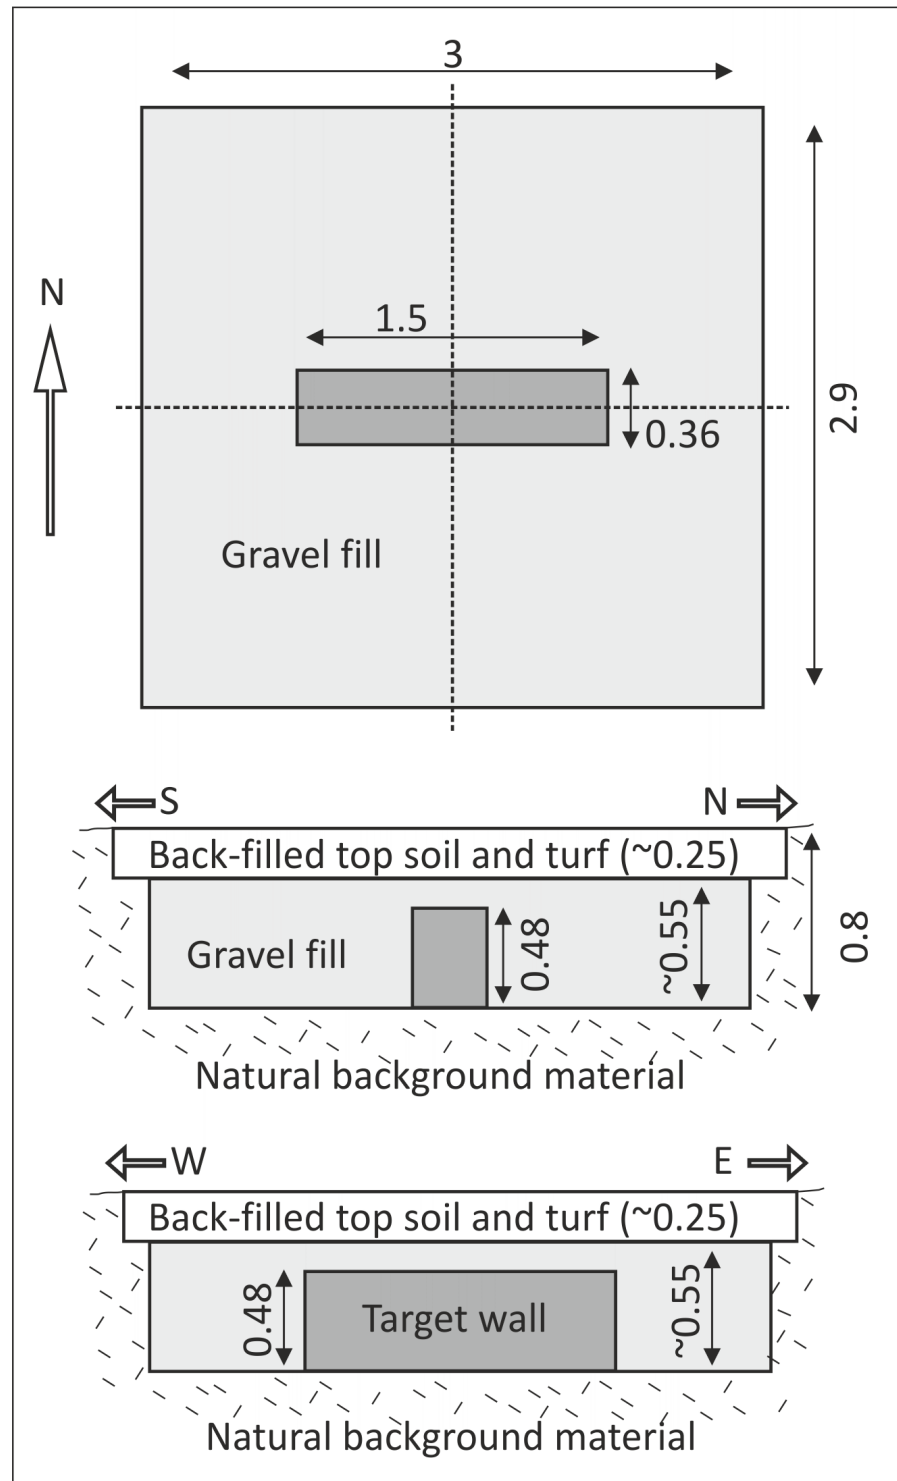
Top (plan view) and two (side views) of the buried cleared-wall foundation (dark grey), test site gravel infill (light grey) and top soil fill (marked) within the test site, with measurement in metres, (modified from Cassidy, 2001).
